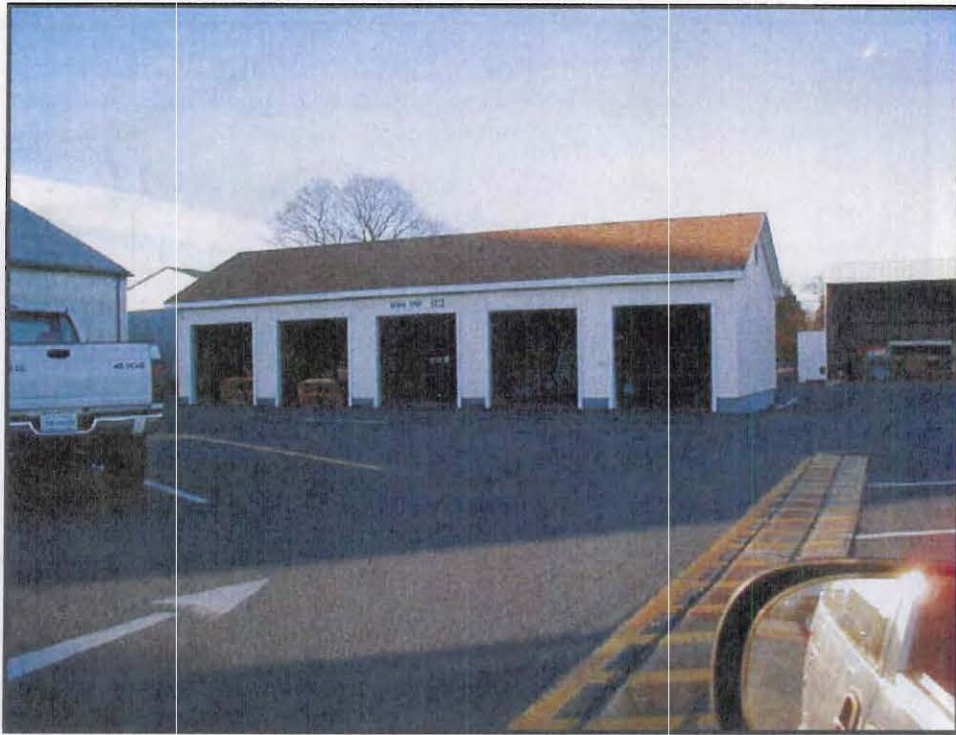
View of Building 334, Public Works Equipment Garage, located in the Industrial Complex – Mainside.
